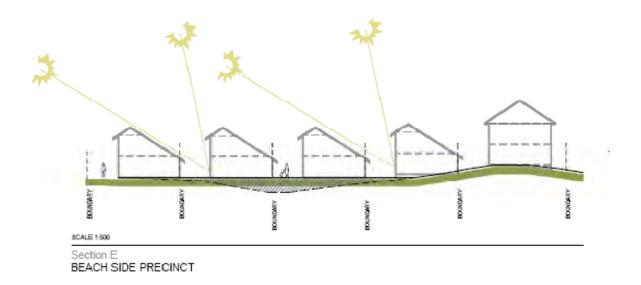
Cross sections of dwellings showing vertical building envelopes ensuring access to northern light. (H+H Architects)
